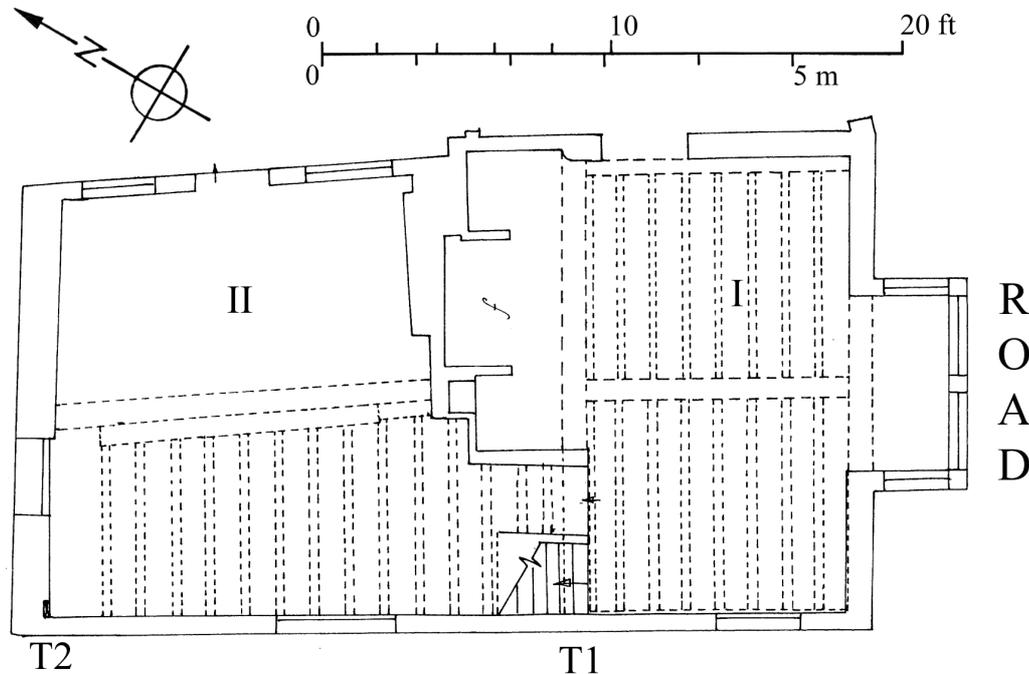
Plan, showing truss and bay numbering (from DBR24 (1981)).
